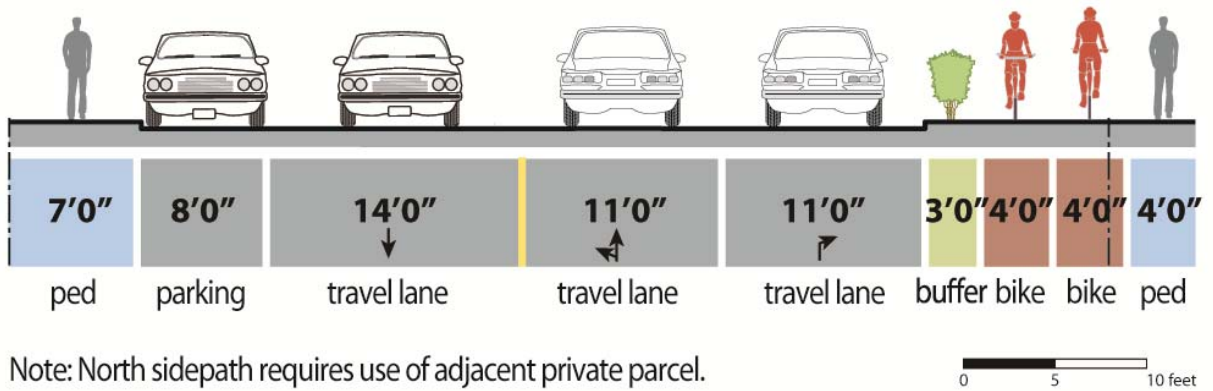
Segment 1G Johnson Street Proposed Improvements
